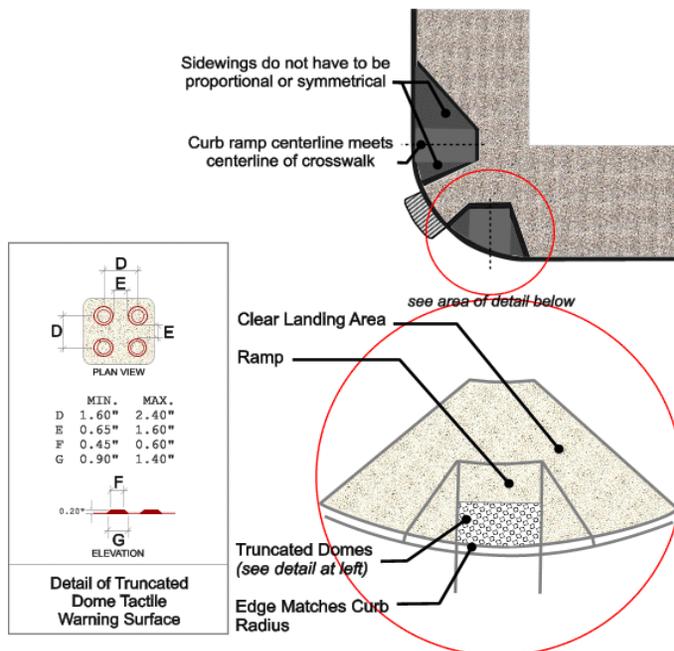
Detail of an ADA-compliant curb ramp design with truncated dome measurements.
